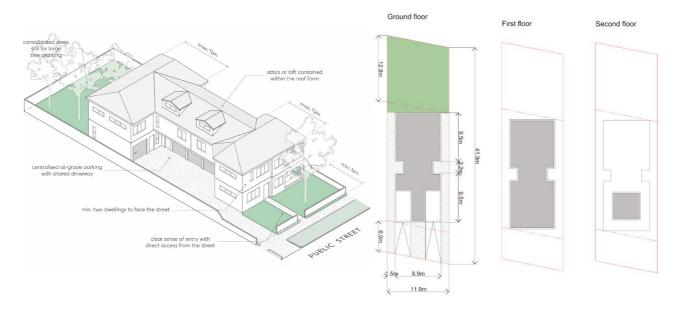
Alignment of proposed EIE FSR and Height testing – observed mismatch for most building types in the EIE, with an RFB example below
